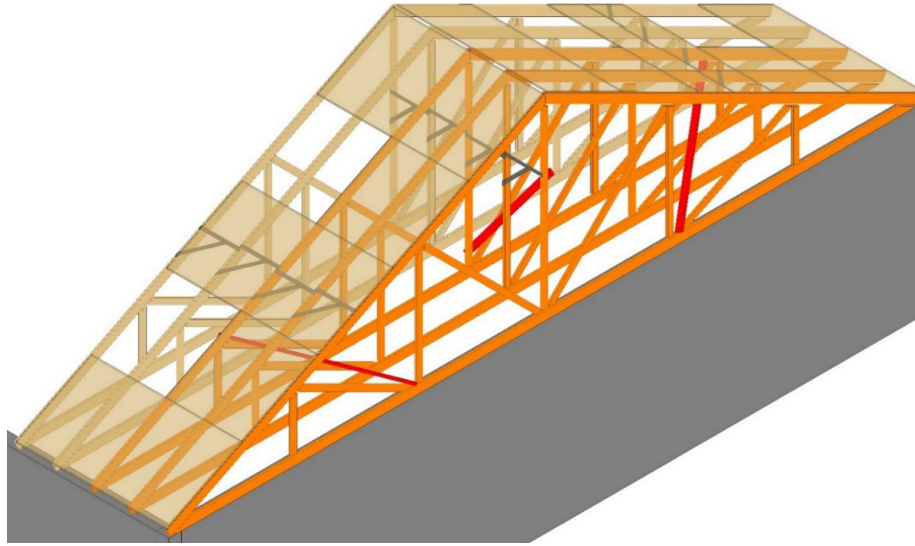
Installation Step 2 – Temporary Bracing of First Three Trusses
